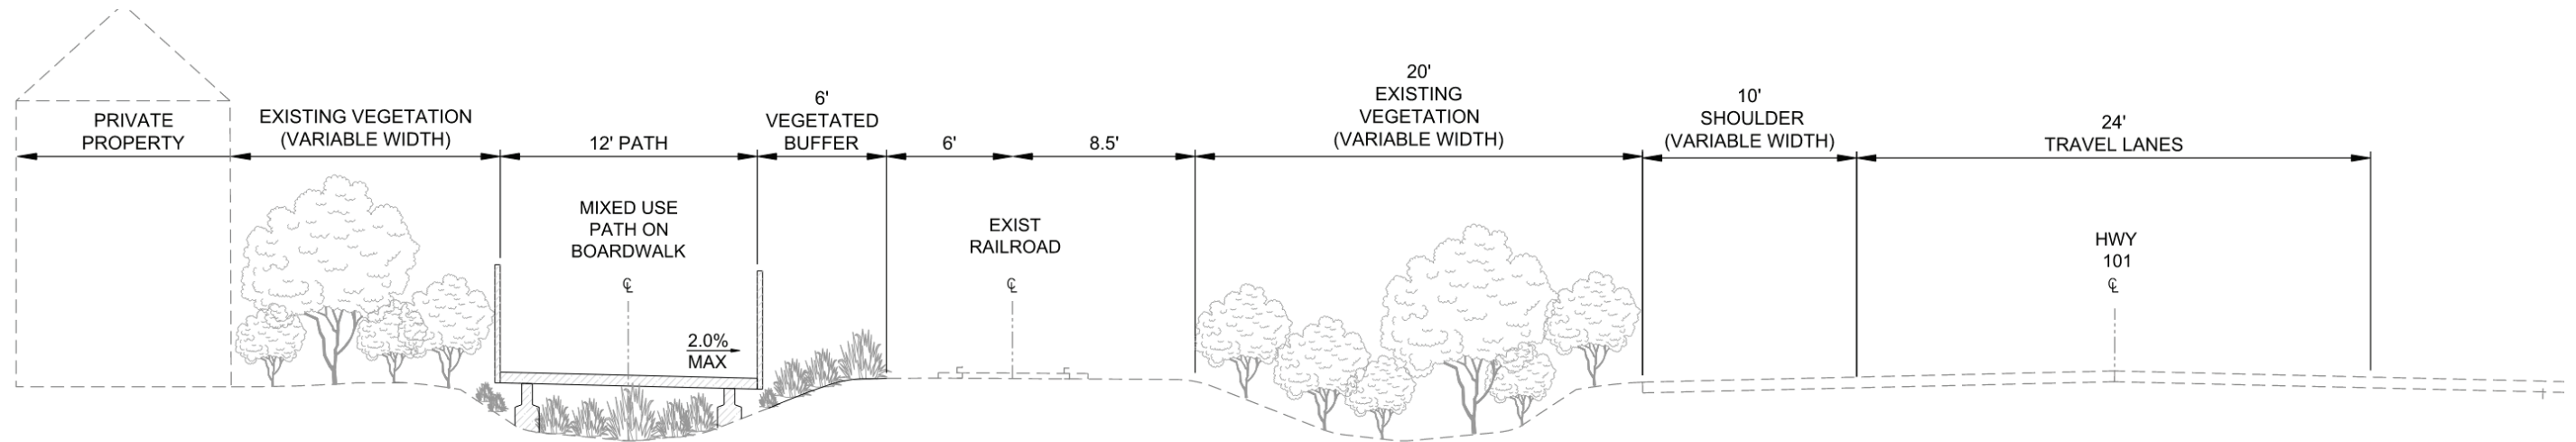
Washington Street to Alder & 7th Avenue to S 3rd Avenue
